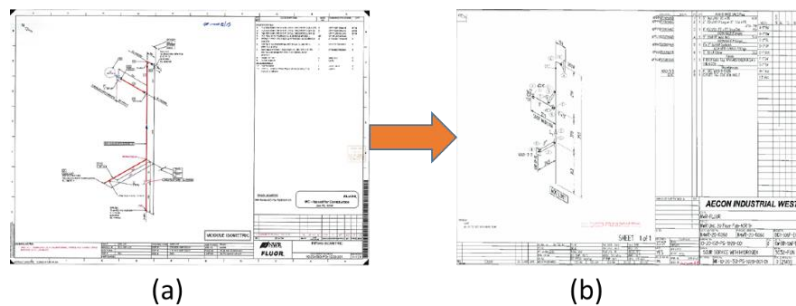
Single isometric translated to a single cutsheet. (a) Received isometric from engineering company. (b) Produced cutsheet for fabrication (refer to Appendix C for larger images)
